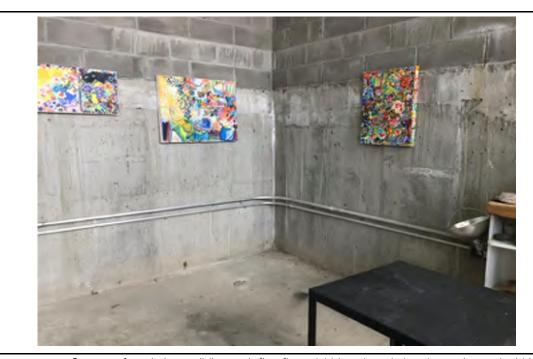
Concrete foundation wall (beneath first floor slab) in subgrade boathouse located within the southern portion of the building, facing north. 30 March 2021.
